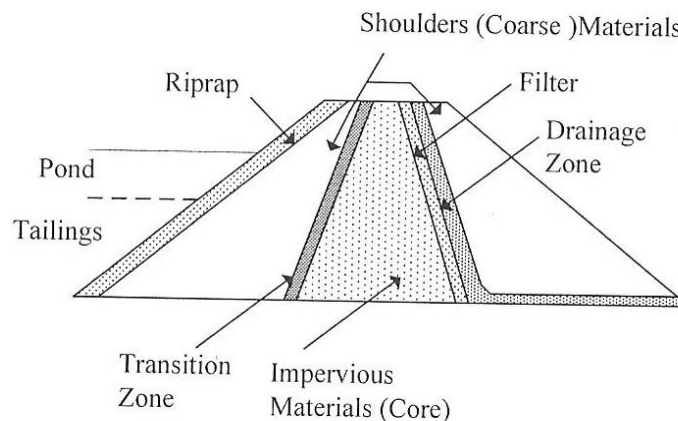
Typical section of a zoned water-retention dam used for tailings storage.
